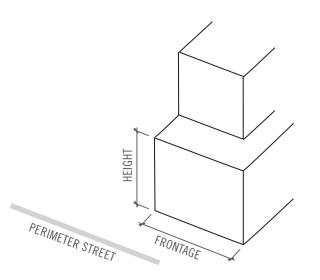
Streetwall Components (see Section 5.3 Streetwall for specific information)
